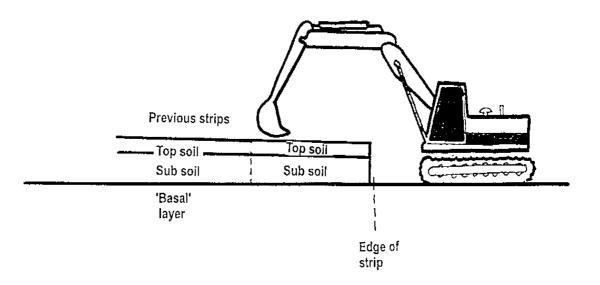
Soil replacement with excavators and dump trucks: Top soil layer
